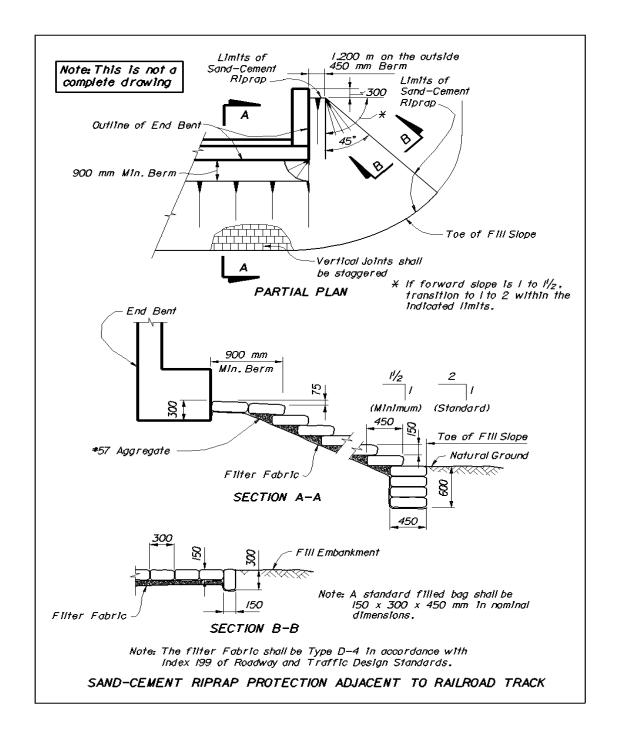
Sand - Cement Riprap Protection Adjacent To Railroad Track
